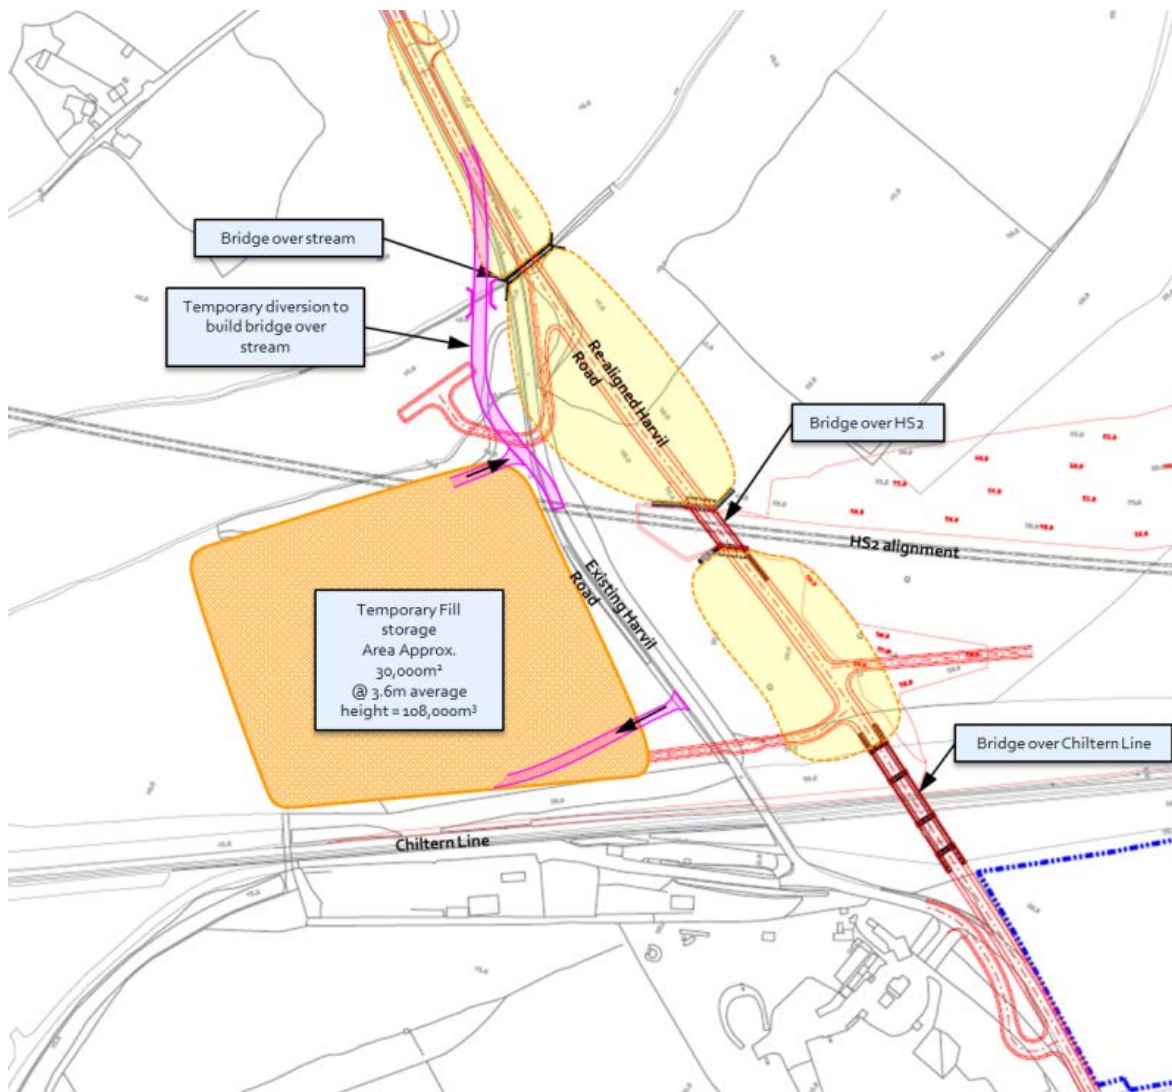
Early Importation of Fill – Harvil Road Embankment
